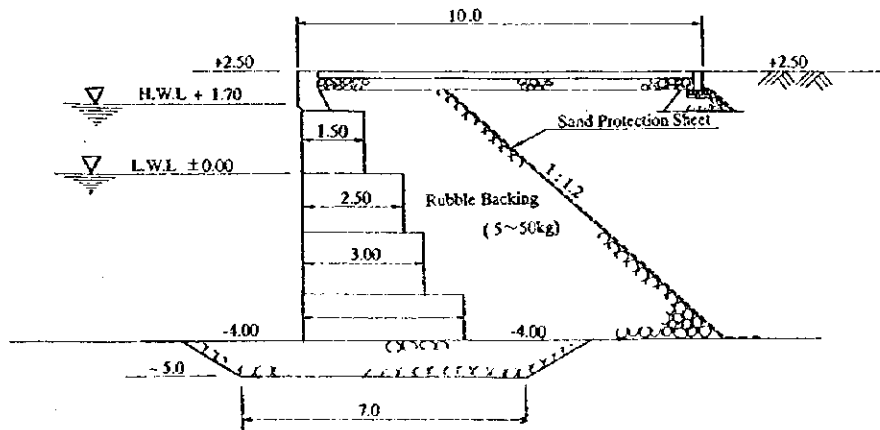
(4) Typical Cross Section of Quaywall (Concrete Block)
